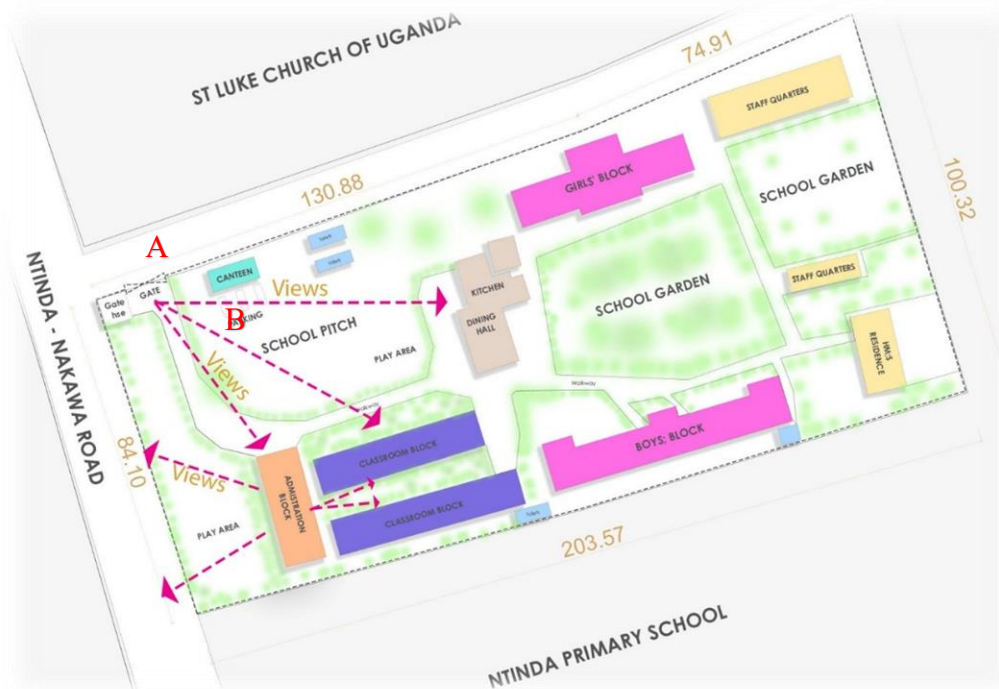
Site plan of the existing school showing clear sight lines towards the school facilities. Source; Google earth – Author, 2021
